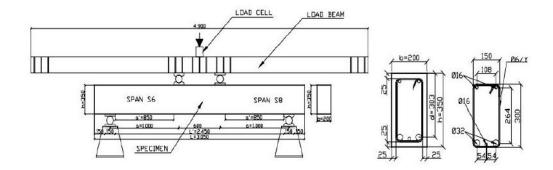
Typical beam and testing setup of Gonzalez et al.
